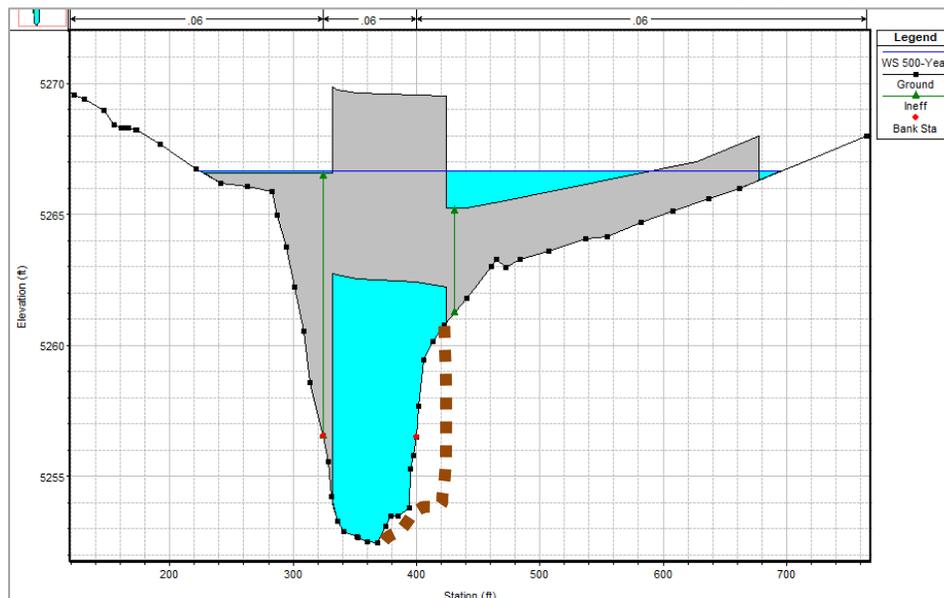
Example of a misaligned channel bank encroaching into the bridge opening due to inaccurate deck projection or structure placement. Although the actual opening is clear, the model geometry creates an artificial restriction.
